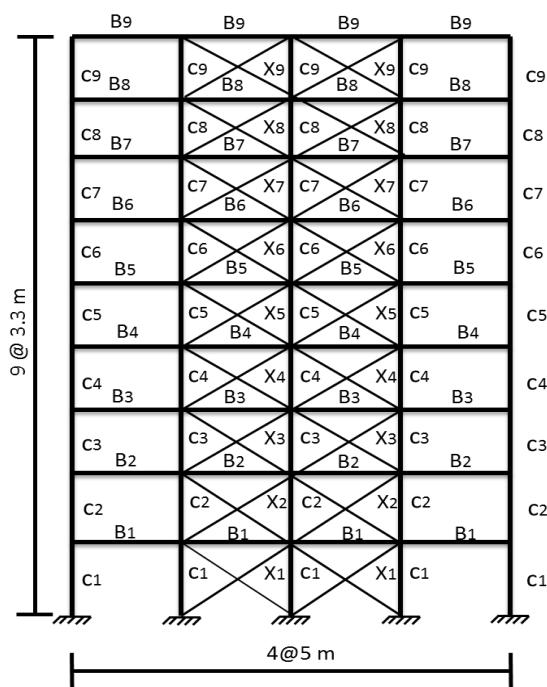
Example 2: 9-story, 4-bay braced frame with grouping details
